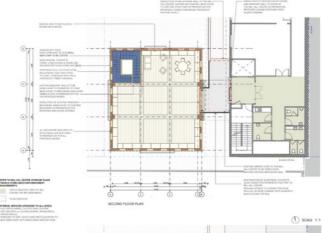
Proposed Second Floor Plan, NTS. Archer Office
